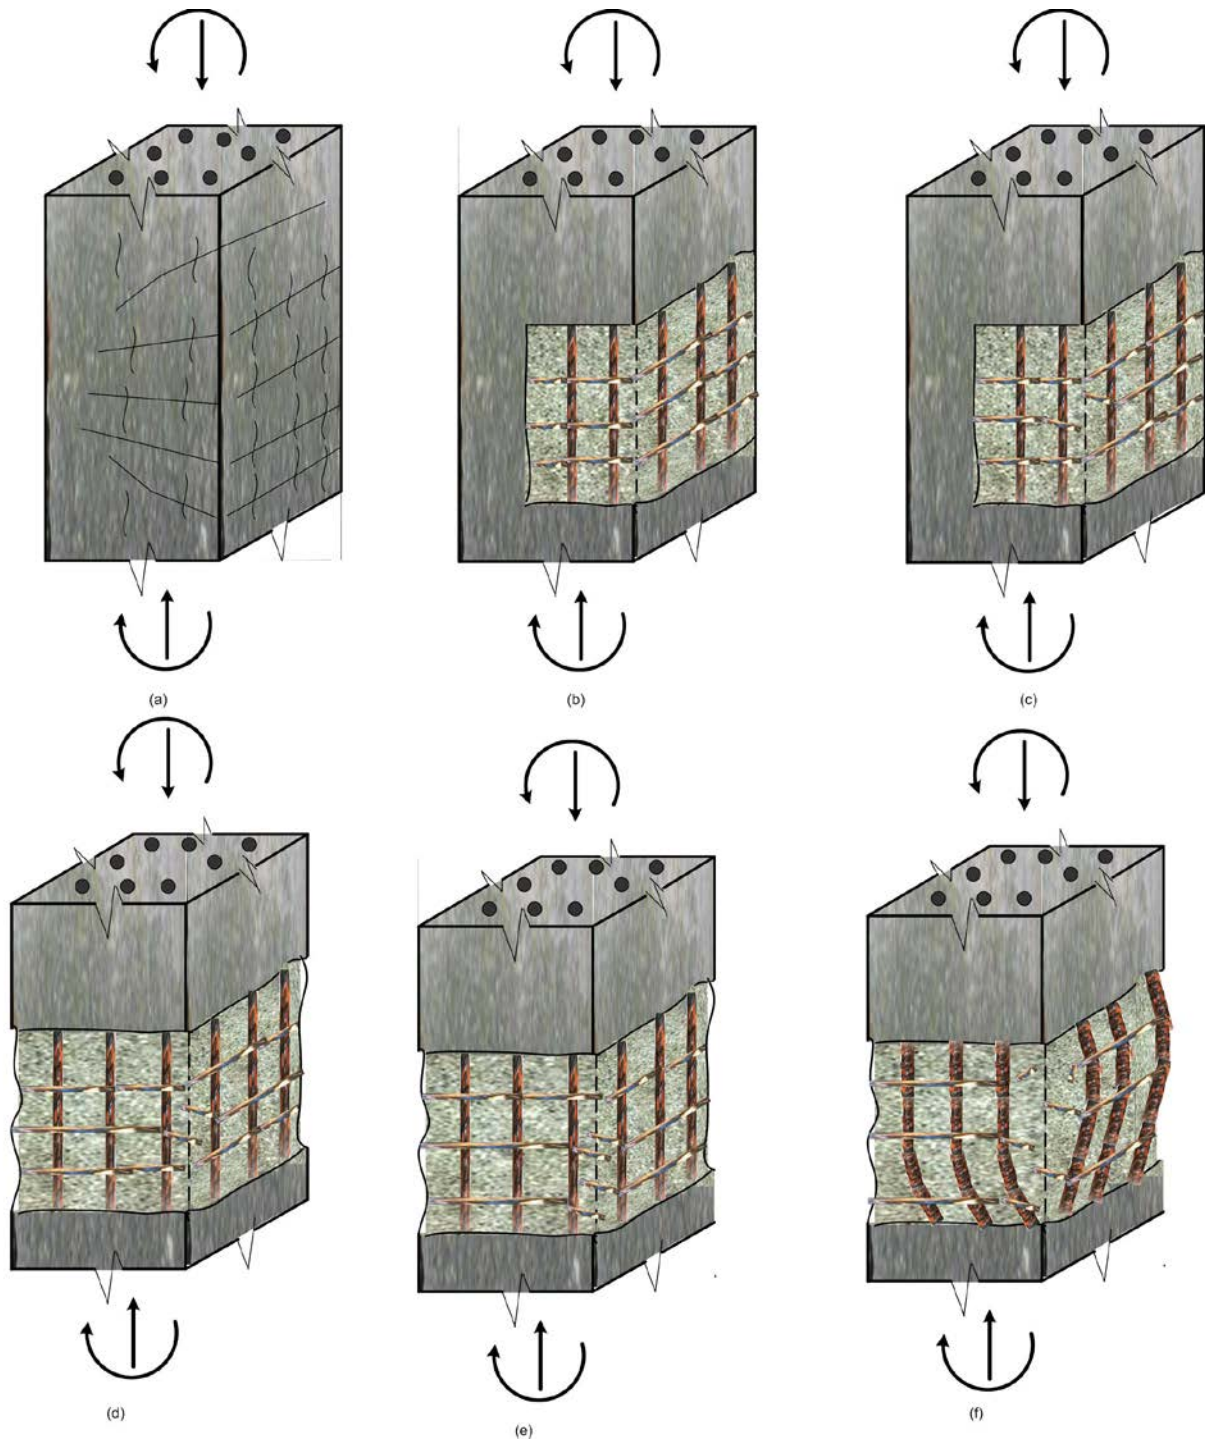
c: Case study V: possible damage of RC beam-column subjected to combined external loads and corrosion; (a) flexural and corrosion cracks; (b) initial spalling; (c) one stirrup failure; (d) spalling on all sides; (e) two stirrups failure; (f) loss of confinement and possible buckling.
